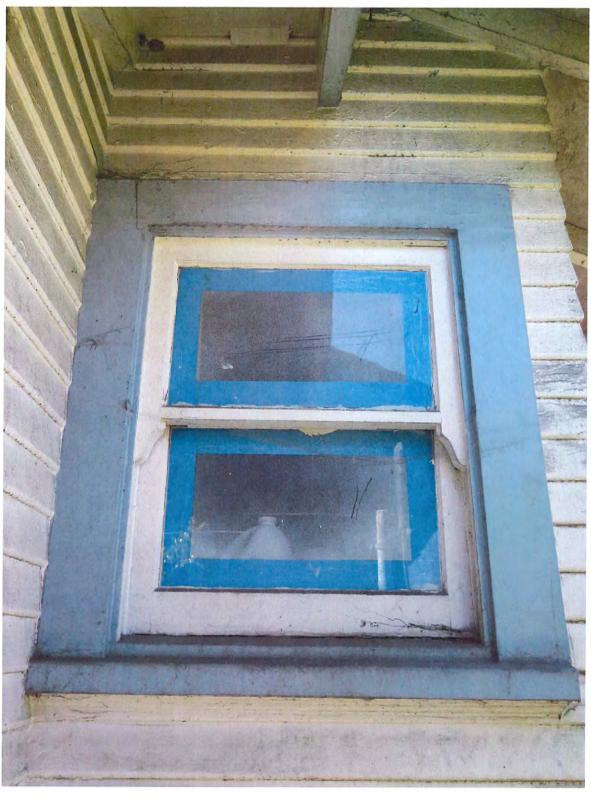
Close-up of an original, wood-framed, double hung window on the east façade.
